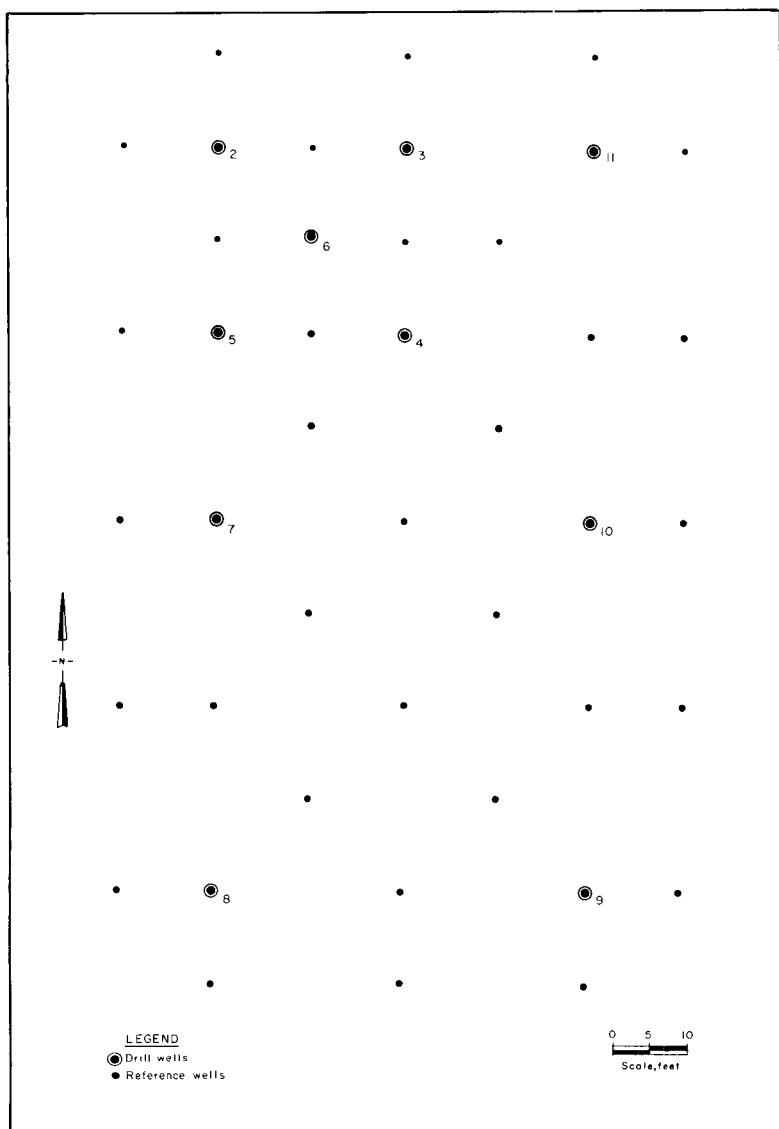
Location of wells and elevation reference markers, Green River site 1.
